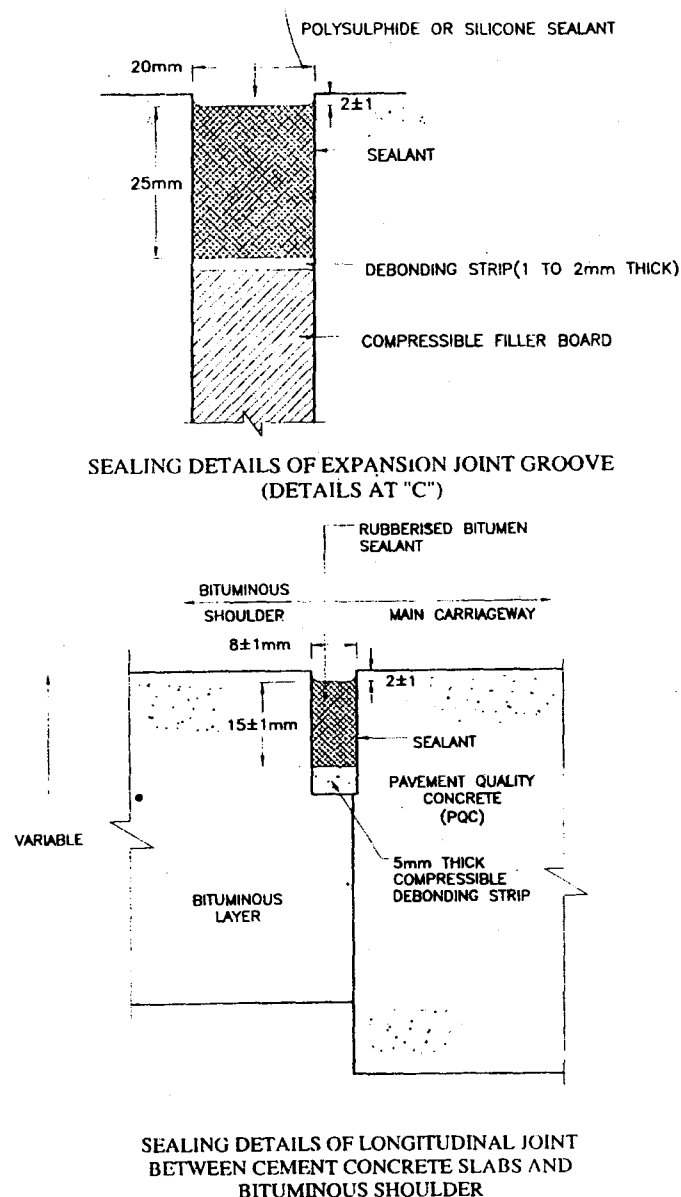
(Contd.) Details of Sealing Joint Grooves (Clause 8.2)
